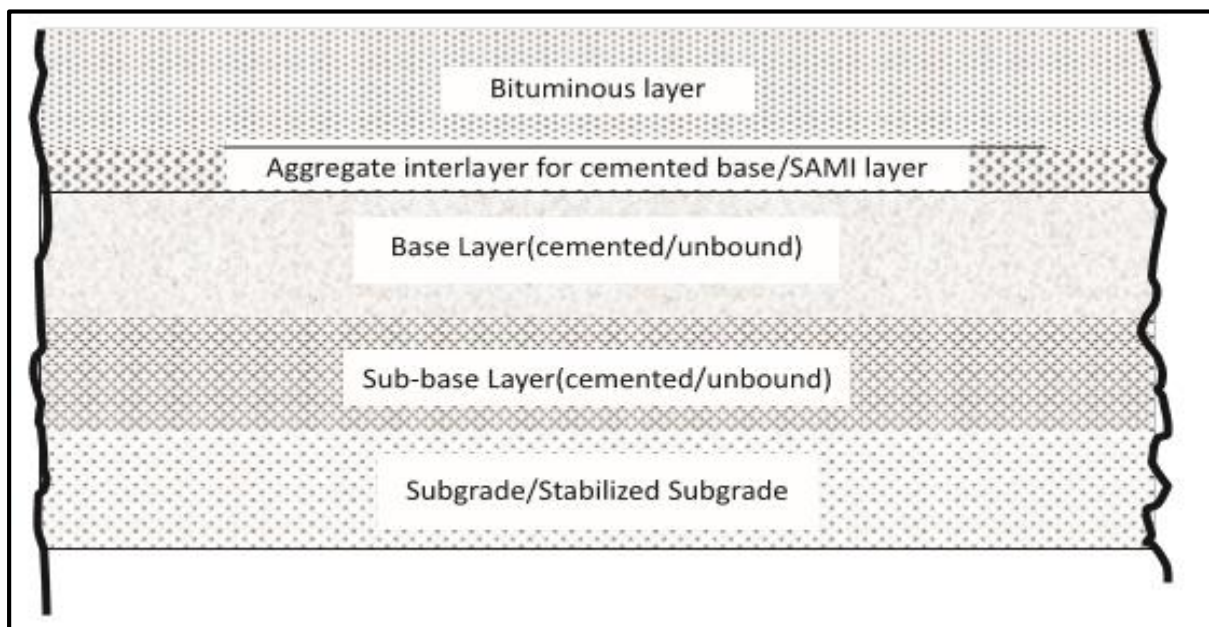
Different layers of Bituminous Flexible Pavement
